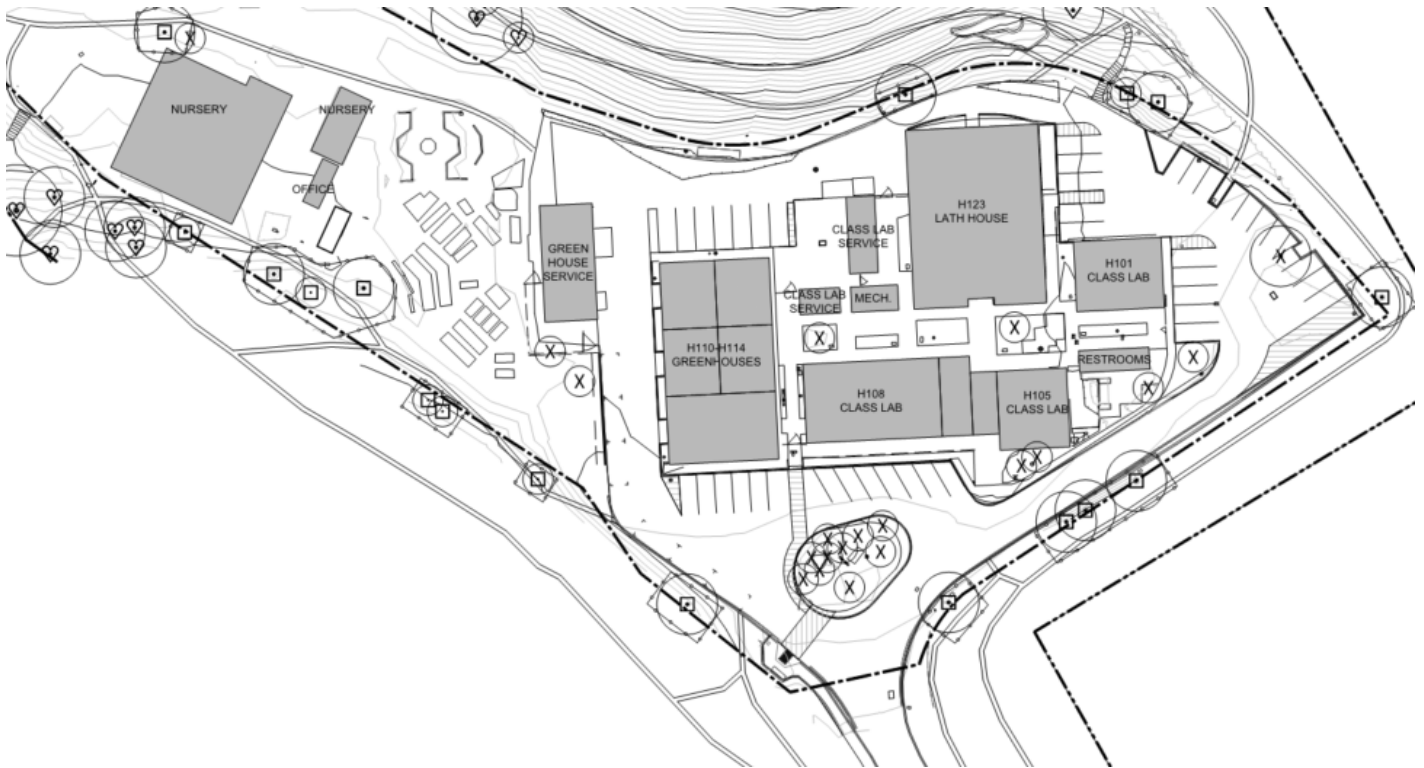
EXISTING SITE PLAN AND PHOTOS OF EXISTING CONDITIONS
